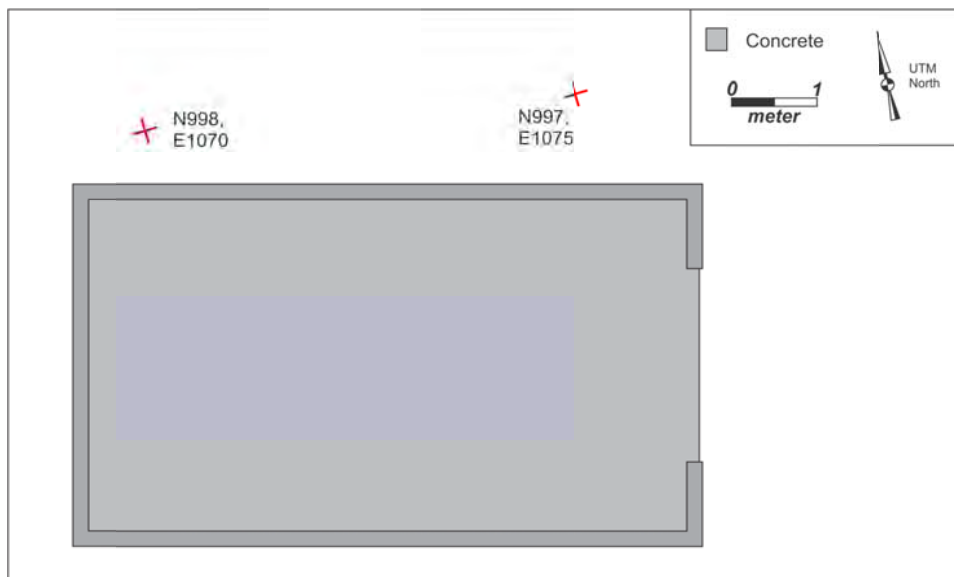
Illustration of the Ruby Hollow garage foundation (Structure #7).
